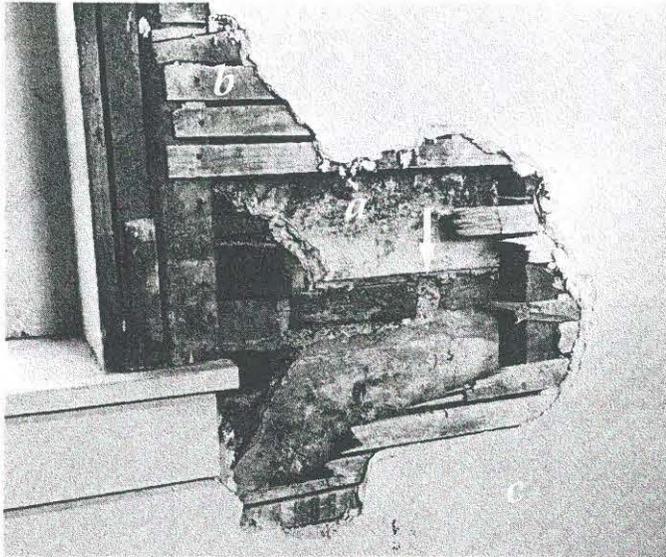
A hole in the wall of a 1760s Custom House in Chestertown, Maryland illustrates the evolution of the room. (a) The original plaster was applied directly to an exterior masonry wall and the chairrail (missing here, see arrow) was in place before the wet plaster was applied to the wall. Sometime later when the interior was modified, the masonry was furred out. Machine-sawn wood lath (b) was nailed to the furring strips and (c) new three-coat plaster was applied. Photo: Maryland Historical Trust.
